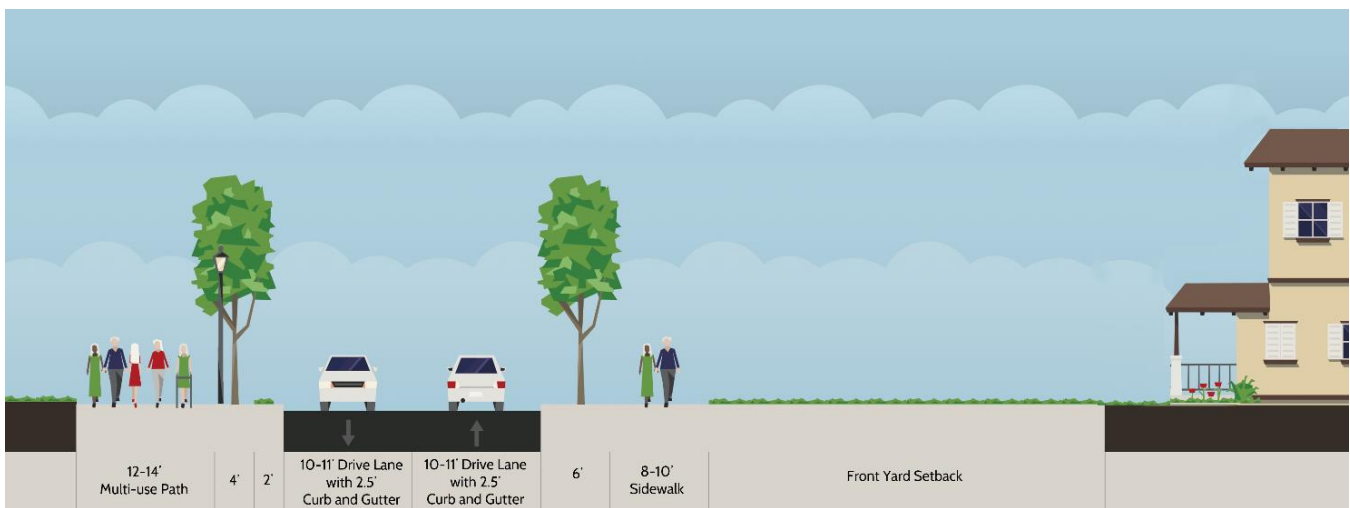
Proposed Typical Section for Collector Road in Residential Area with Multiuse Path
